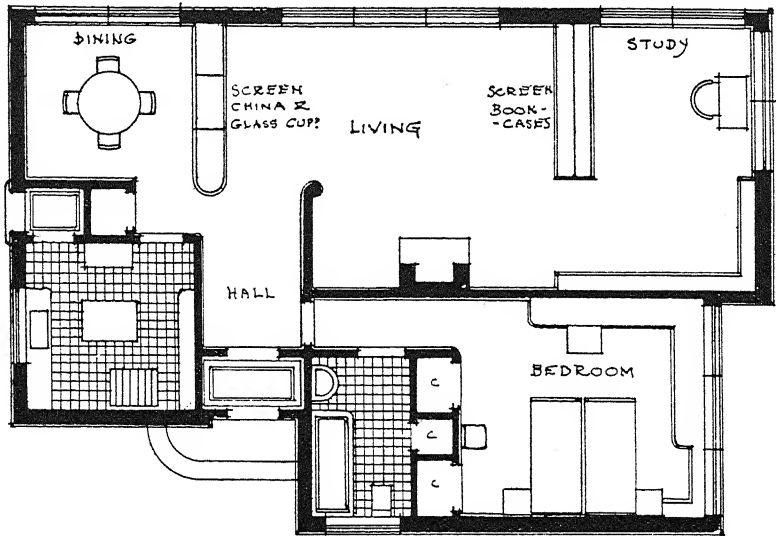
Diagram Plan of domestic units, with screened sections to Living Room.
